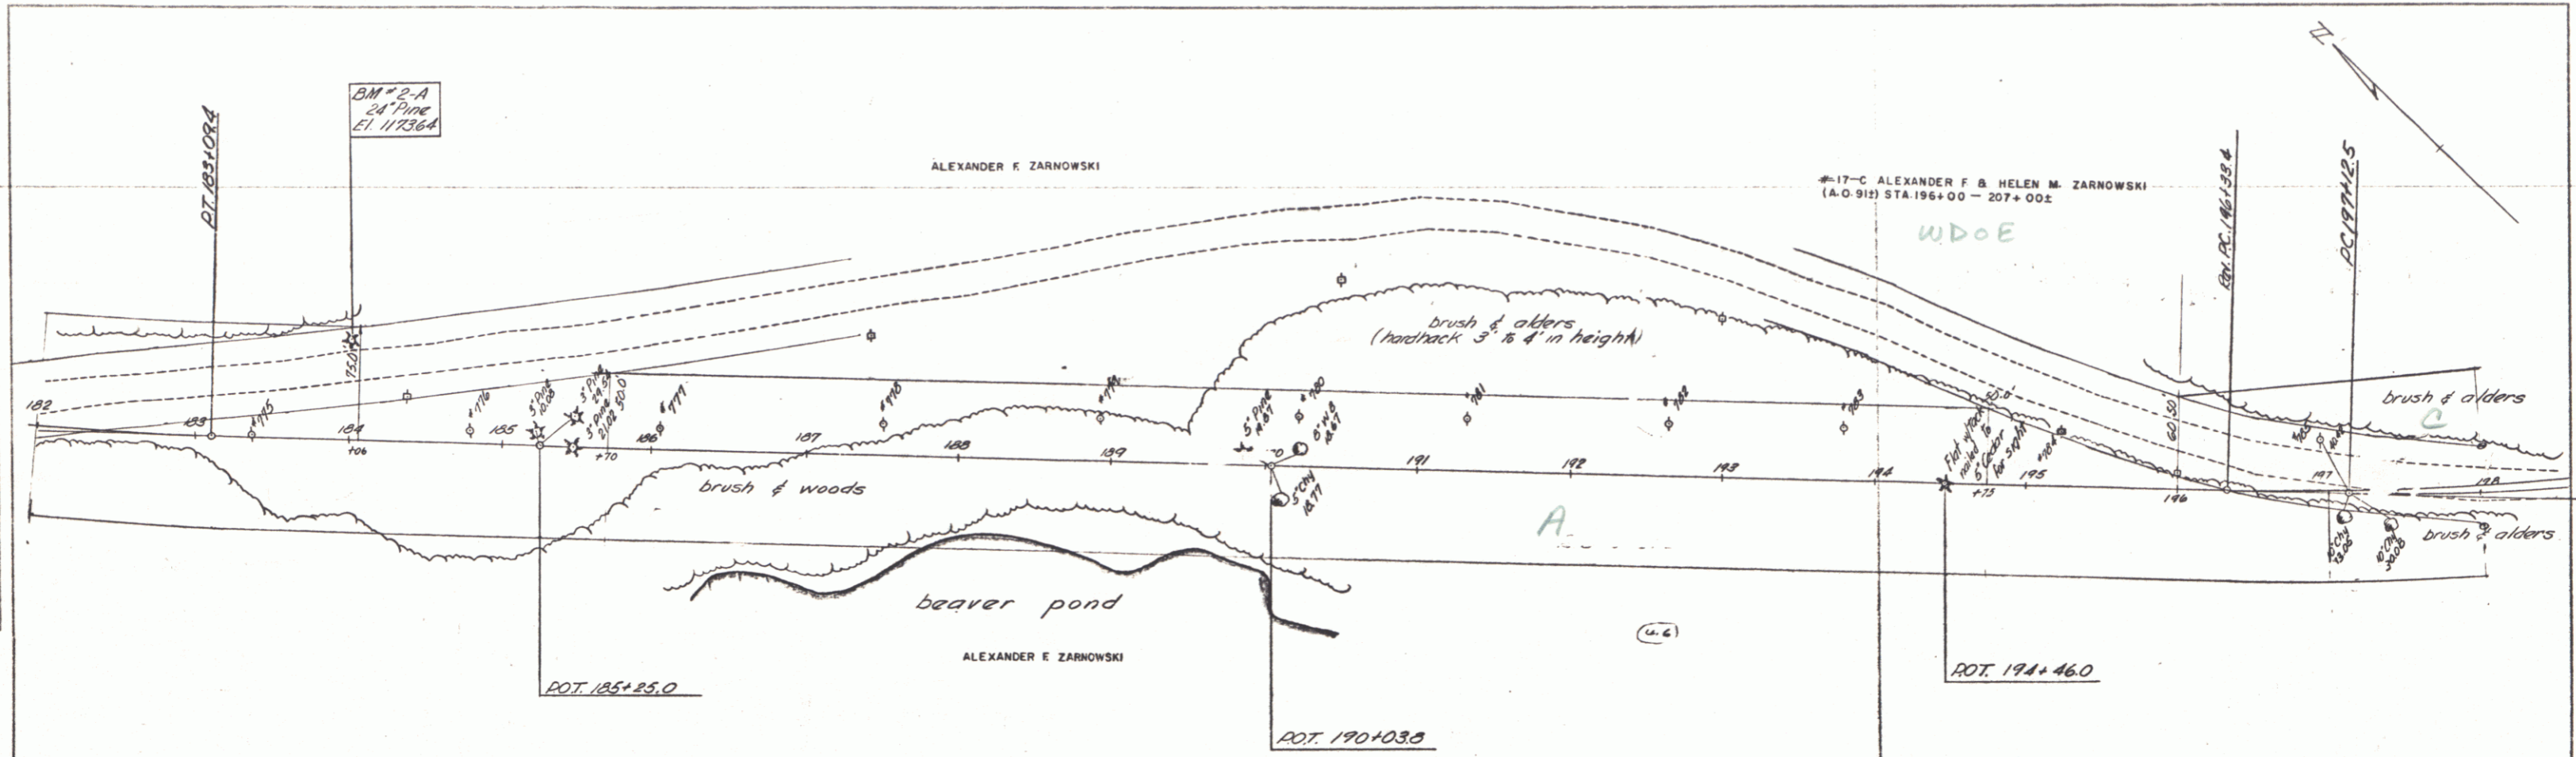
PLAN PROFILE & P & B BY STANDARD
